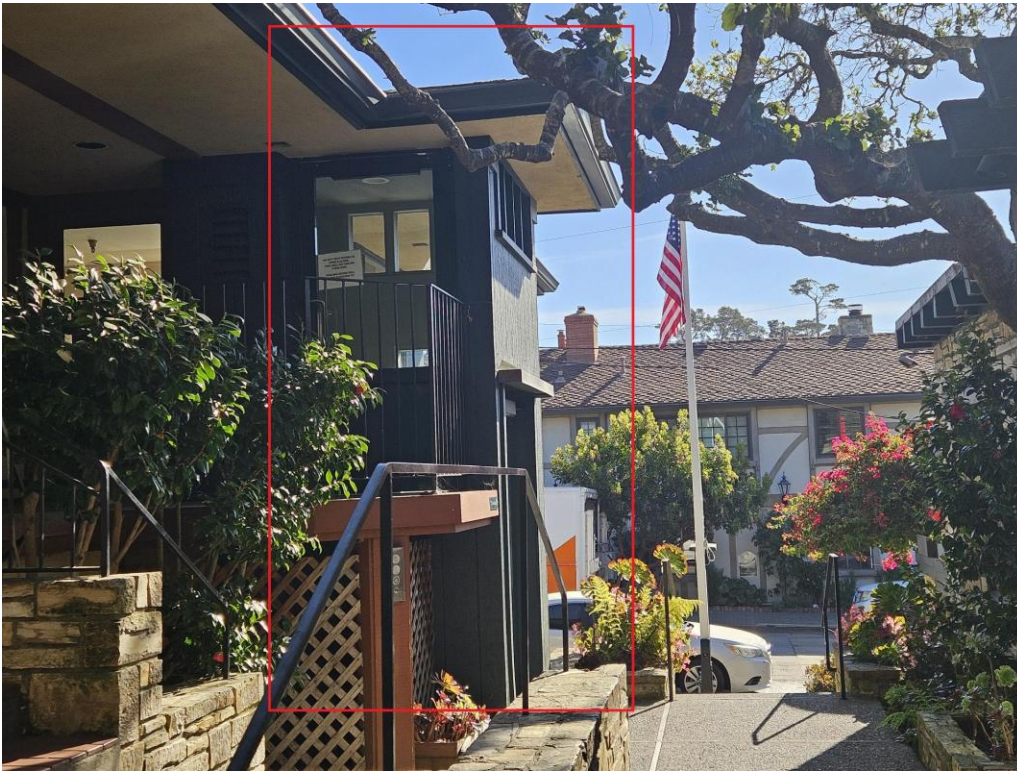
2012 ADA elevator enclosure and extended roofline indicated in red.
